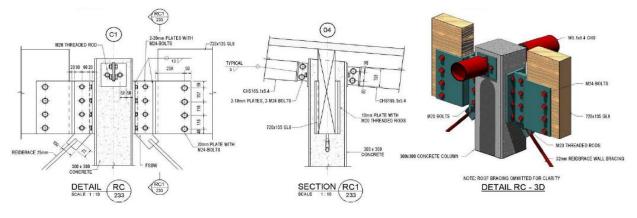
Structural steel connections – shop drawings (BCA, 2013c).
